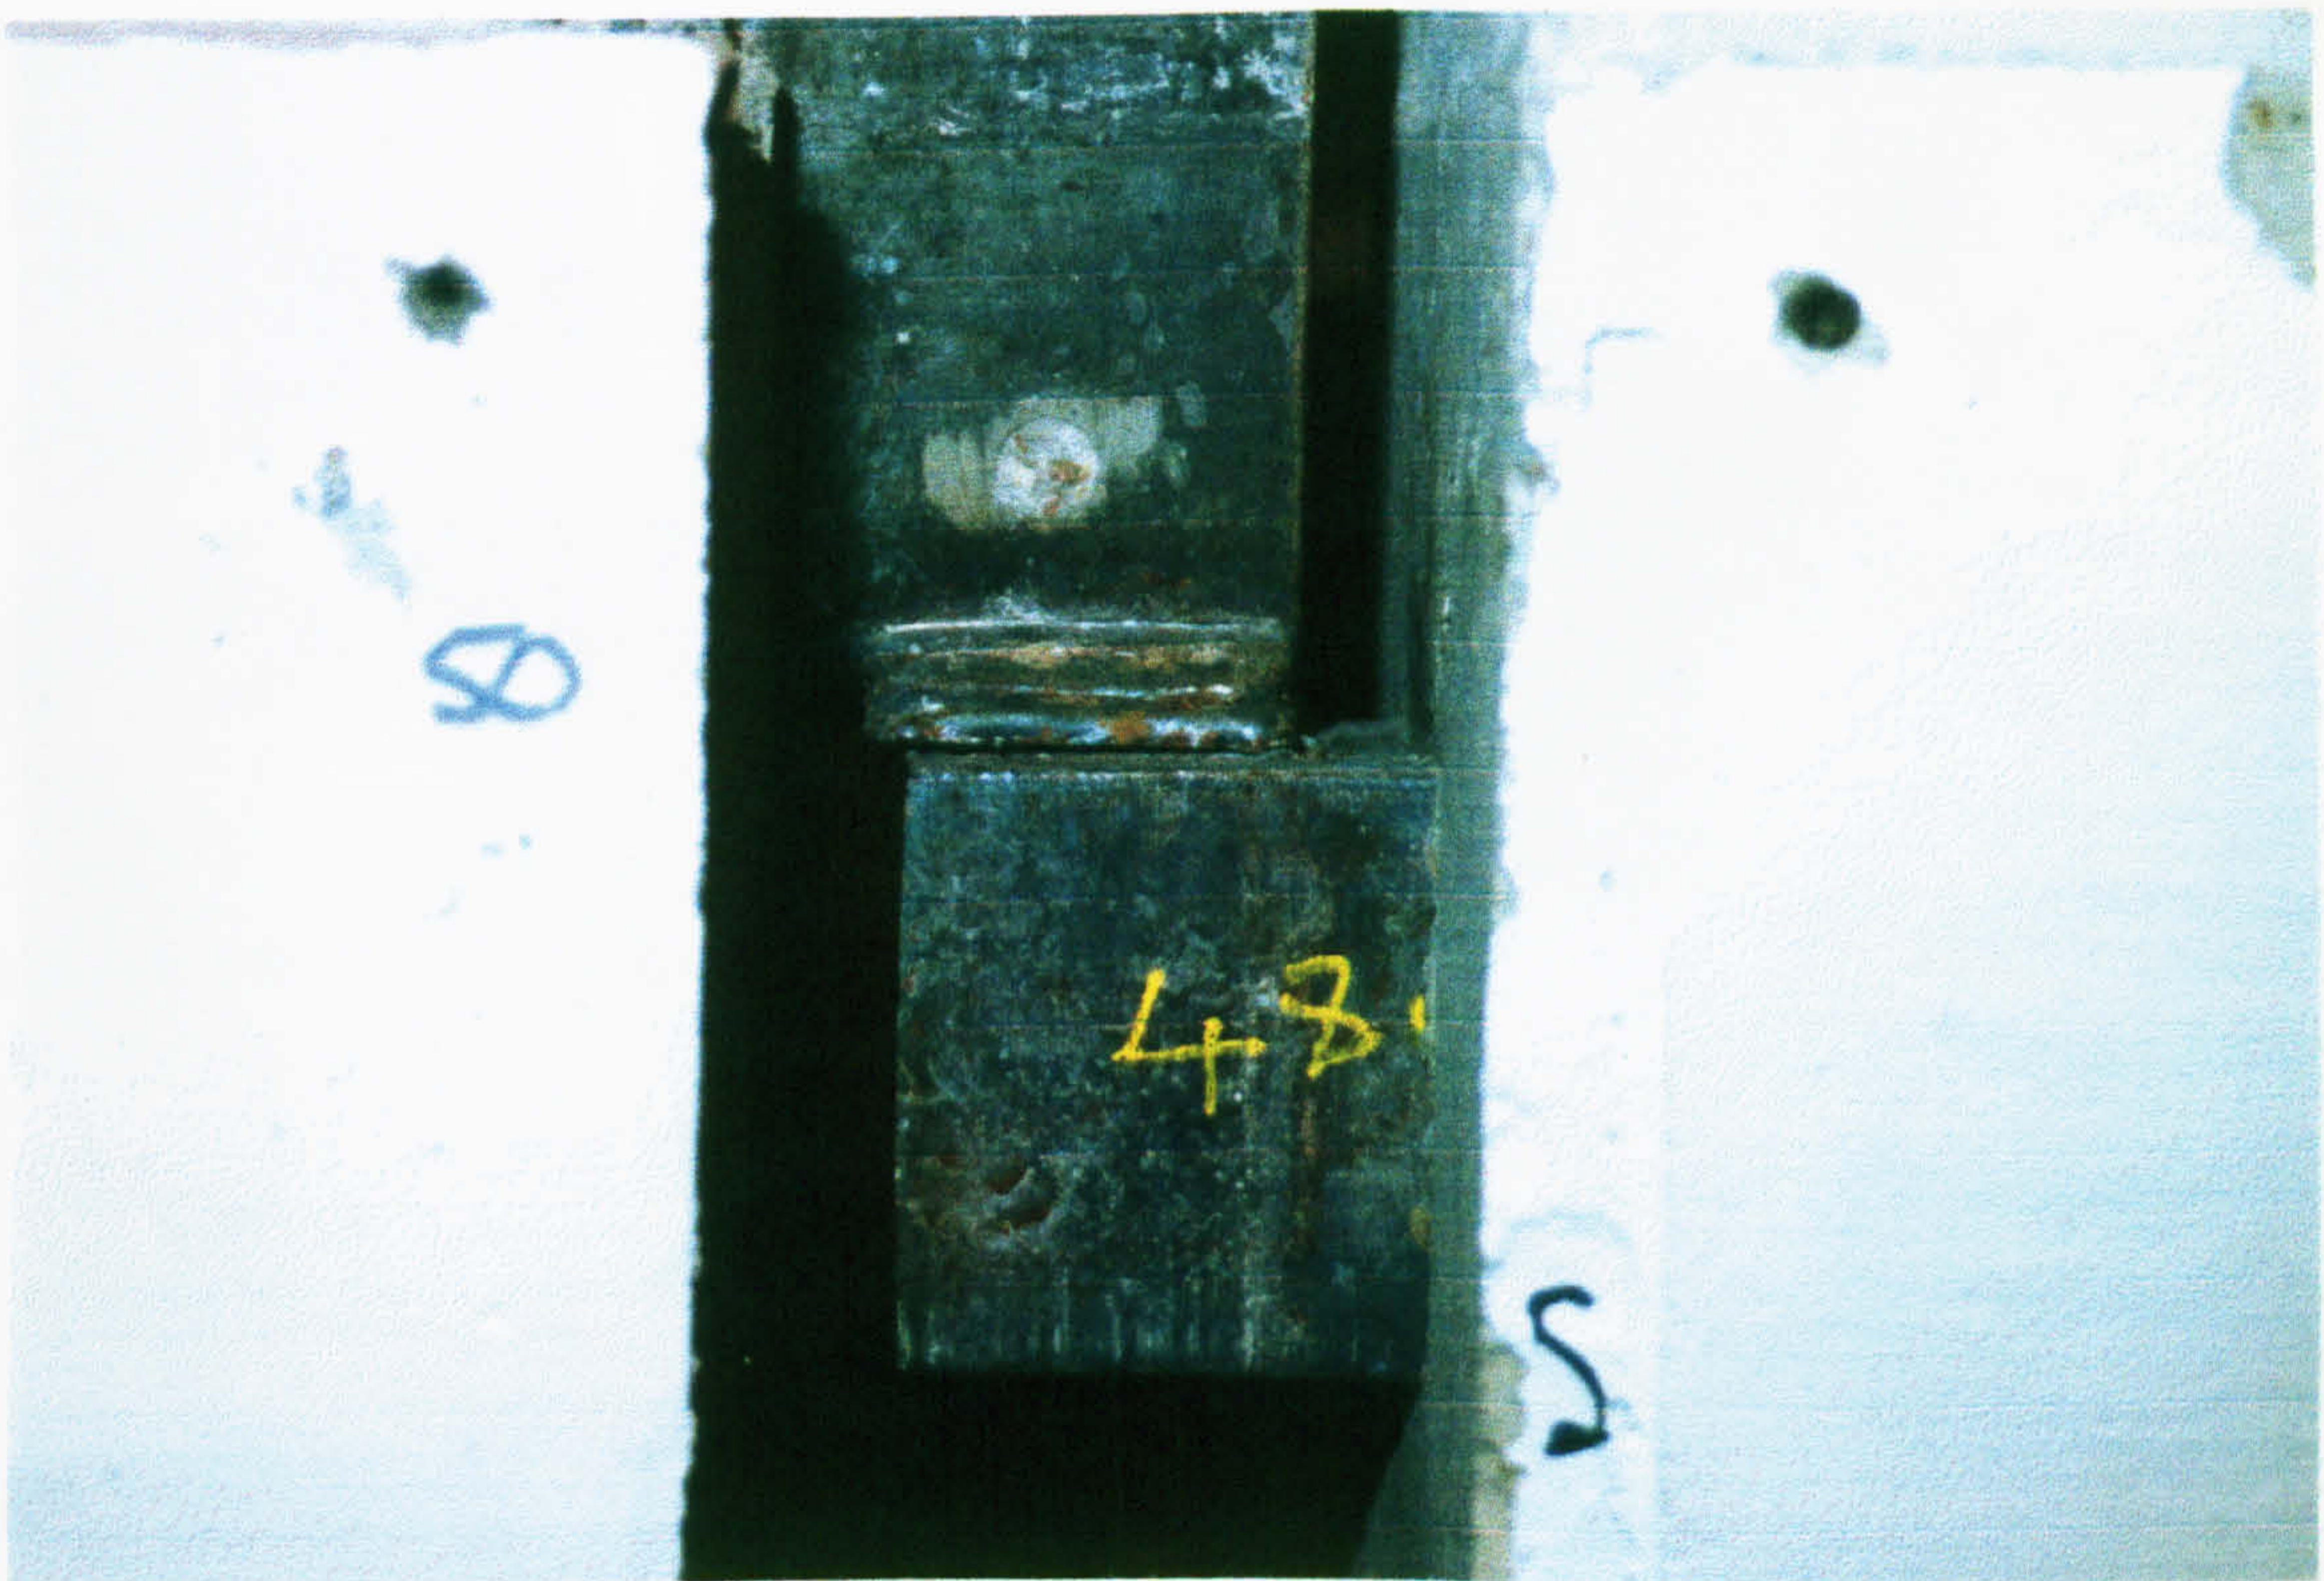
Completely broken weld in beam 2 from East after testing TW1(B)
